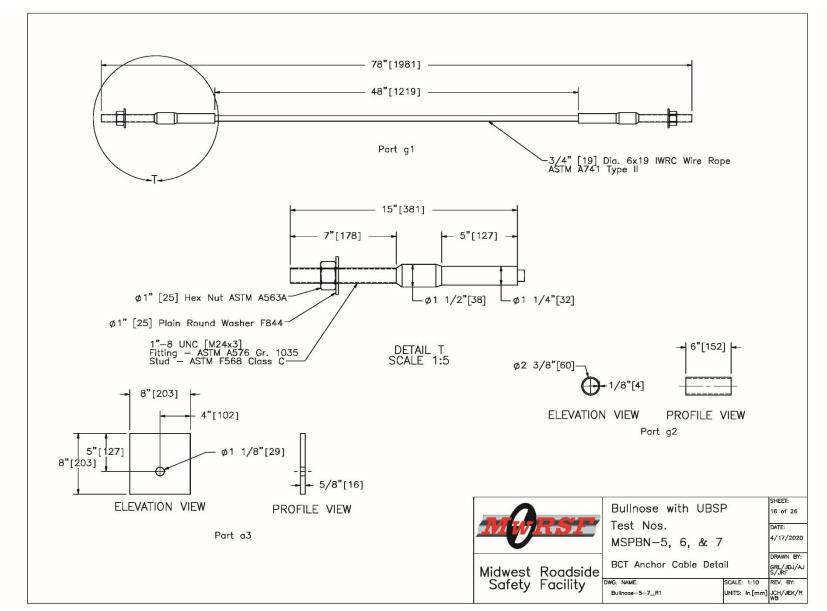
BCT Anchor Cable Detail, Test Nos. MSPBN-5 through MSPBN-7
